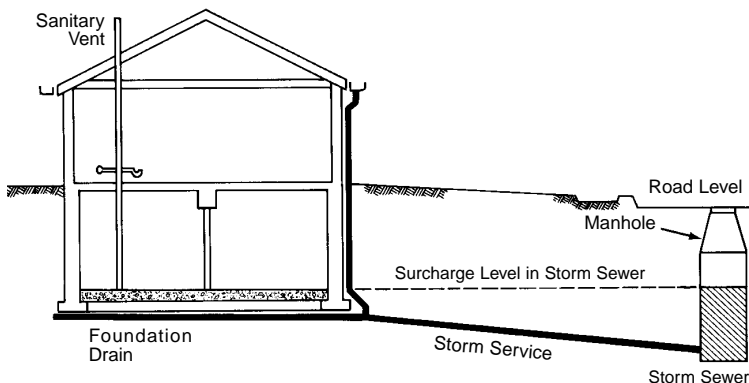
Foundation drain and downspout connected to storm sewer by gravity.
